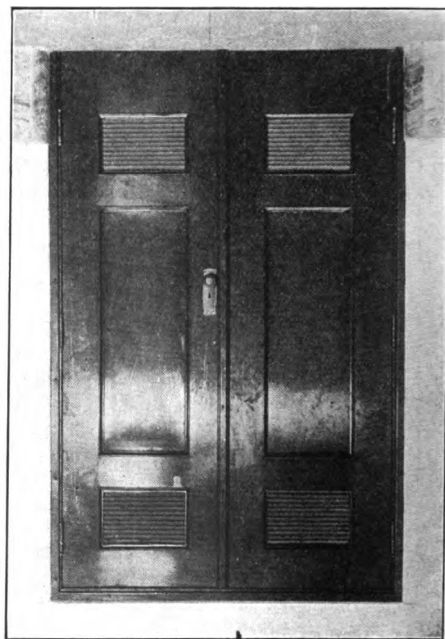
DOUBLE DOORS, WITH LOUVRE TOP AND BOTTOM, TO TRANSFORMER CLOSET AT END OF PLATFORM.
